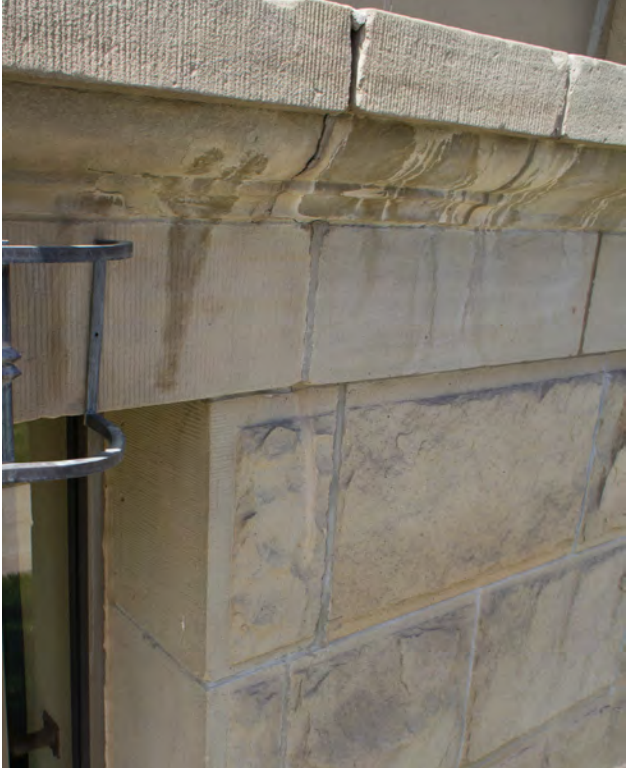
East Elevation Cracked Stone and Mortar Joint at the Cornice above a Cracked Stone Unit That Has Been Repaired.
